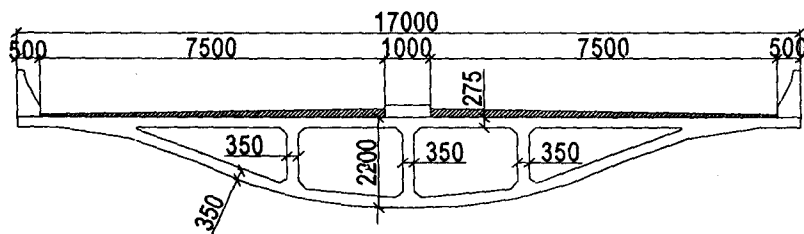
Typical cross section with Fish belly for 4-lane deck
